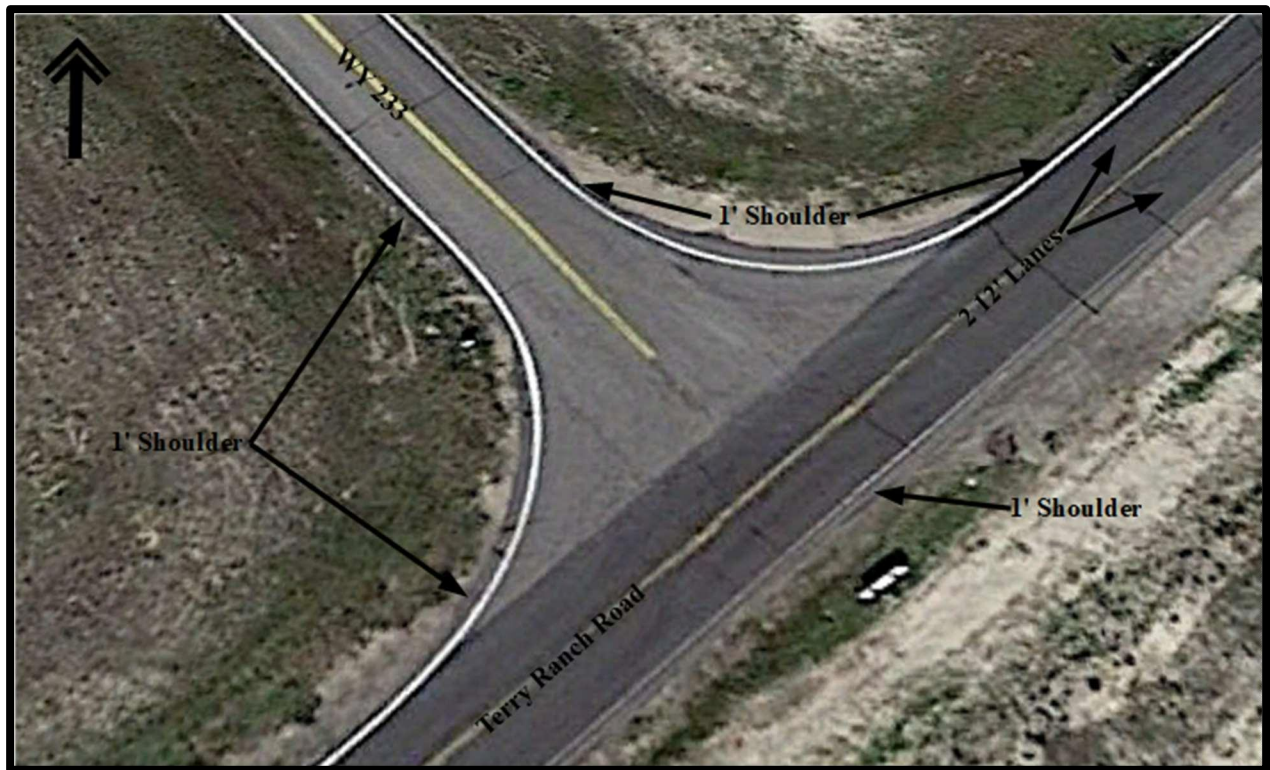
Aerial View WY 223/Terry Ranch Road Intersection
